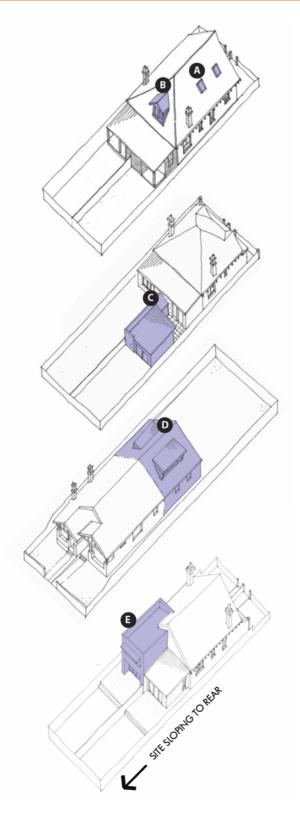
Design solutions for additions to single storey semi-detached dwelling houses
